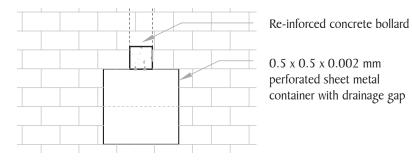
Litter Bin Plan. Scale: 1:25 (Author, 2008)
